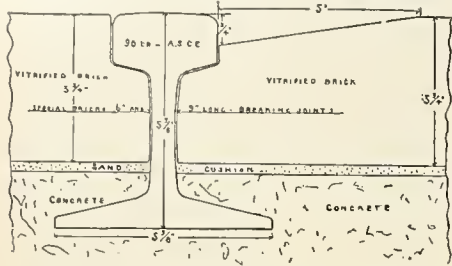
LATEST TRACK CONSTRUCTION IN KINGSTON, N. Y., SHOWING SPECIAL BRICK OUTSIDE OF RAIL.
